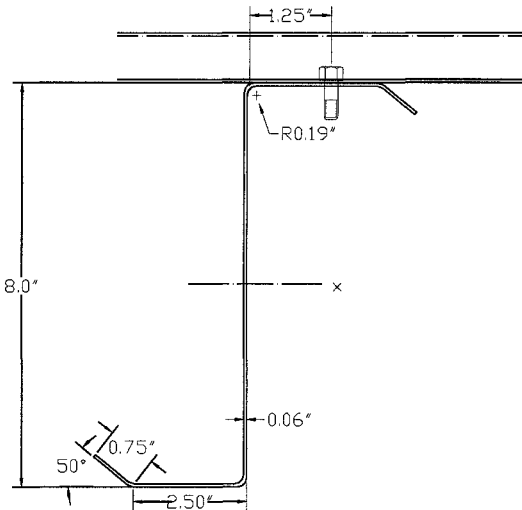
Purlin with One Flange Through Fastened to Sheathing
